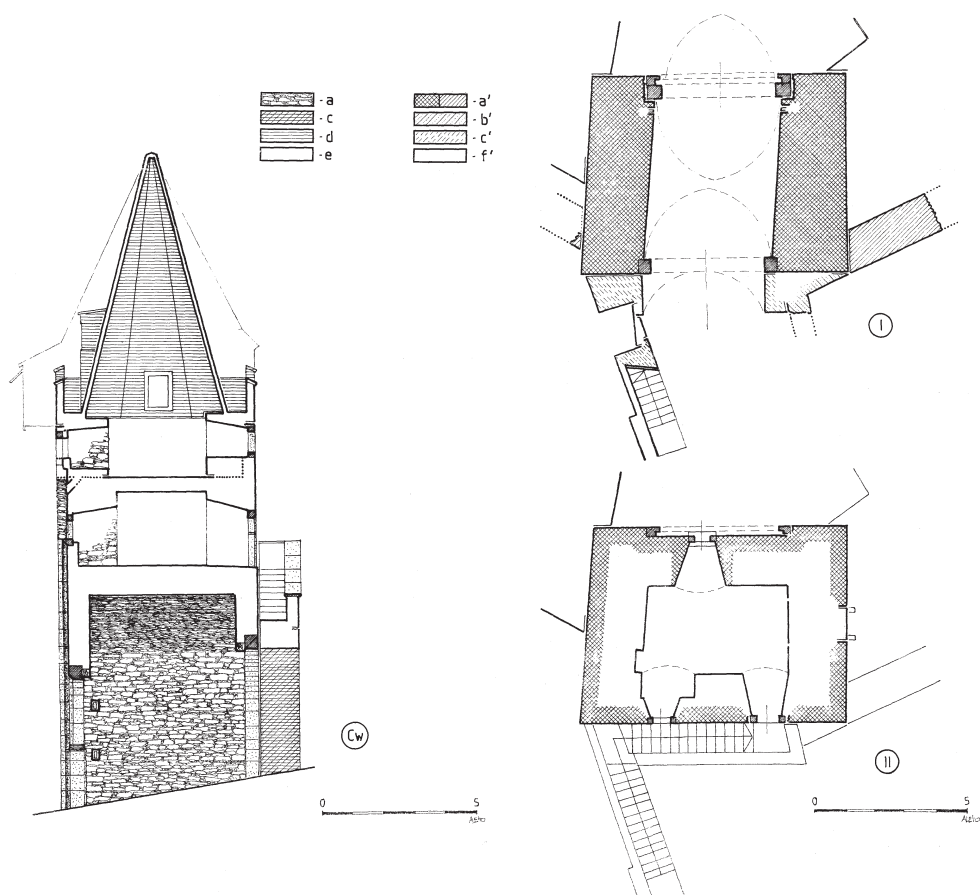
Bystrzyca Kłodzka, Wodna (Water) Gate, crosssection with a view to the west (Cw) and projections of passage and guardhouse (guardroom ?) levels (I, II) with chronological wall stratification (signs: a, a' – Gothic walls from the 14<sup>th</sup> century; b, b' – Renaissance walls (tenement house adjacent); c – Baroque walls from the 18<sup>th</sup> century; d, d' – walls from the 19<sup>th</sup> century; e, e' – walls from the 20<sup>th</sup> century; f – unrecognized walls (drawn by A. Legendziewicz))
